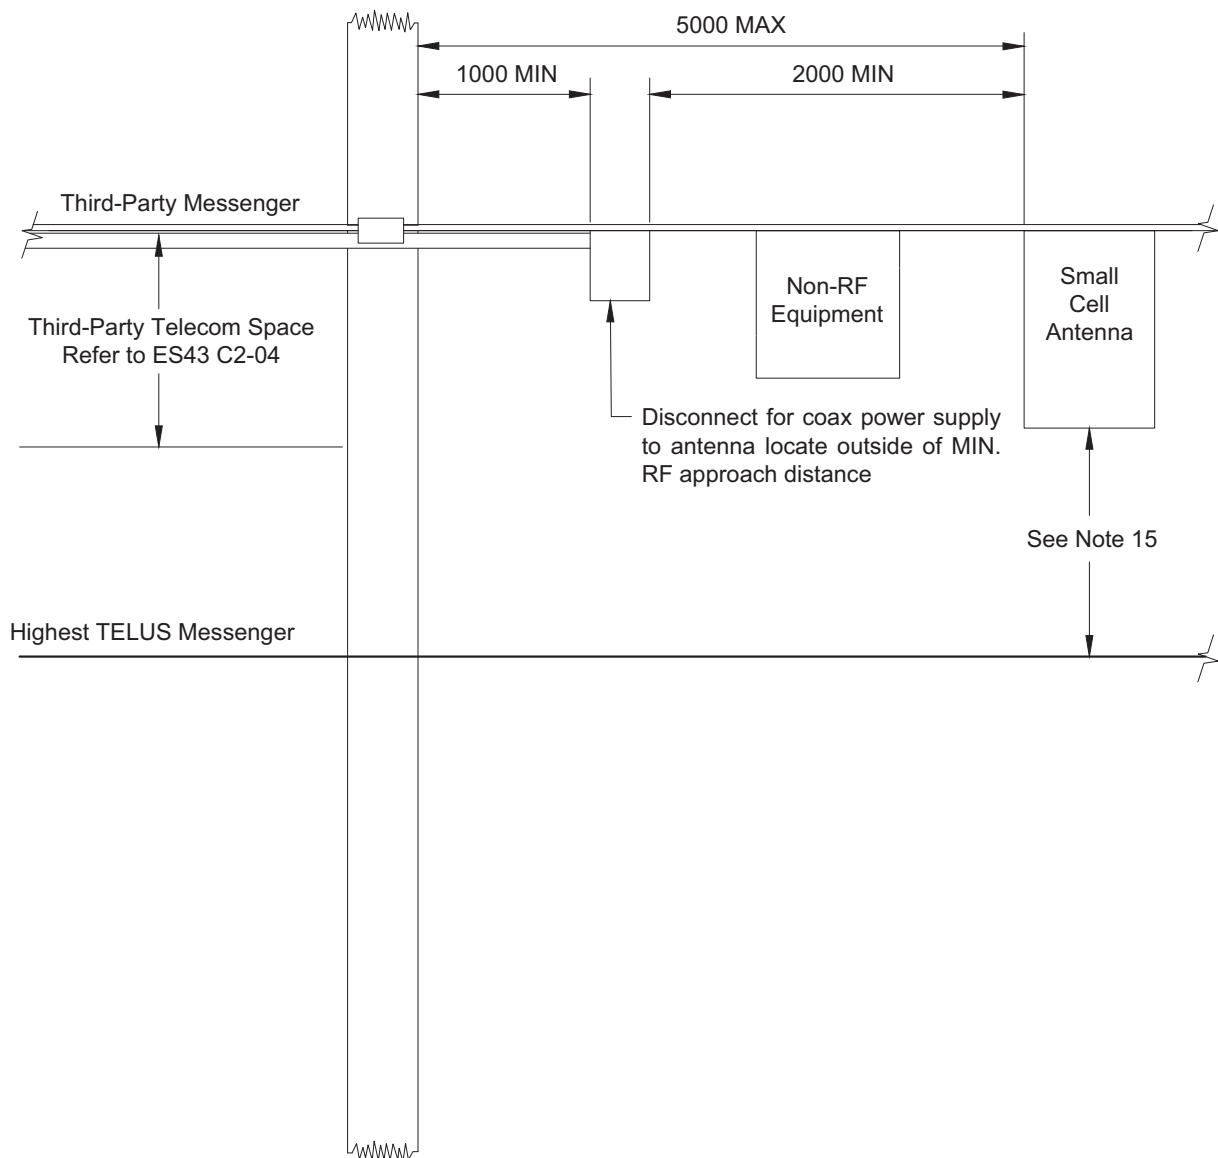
Layout and clearances for strand-mounted equipment (NTS)
